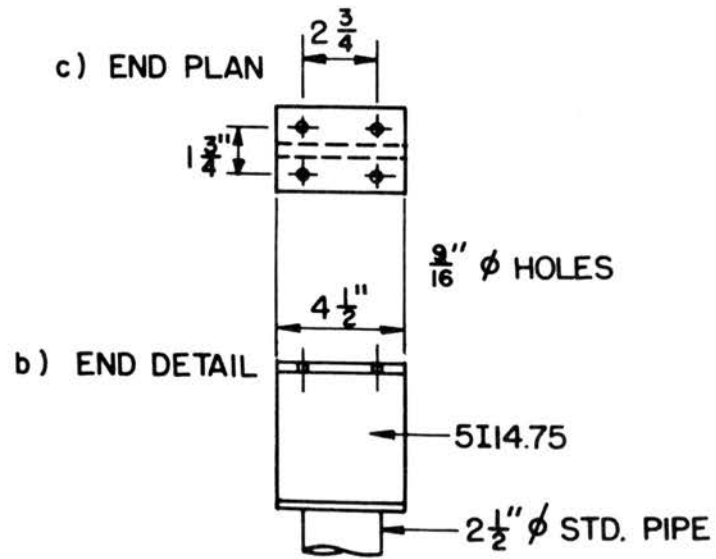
DETAILS OF HANSON'S COLUMNS, TYPE S
